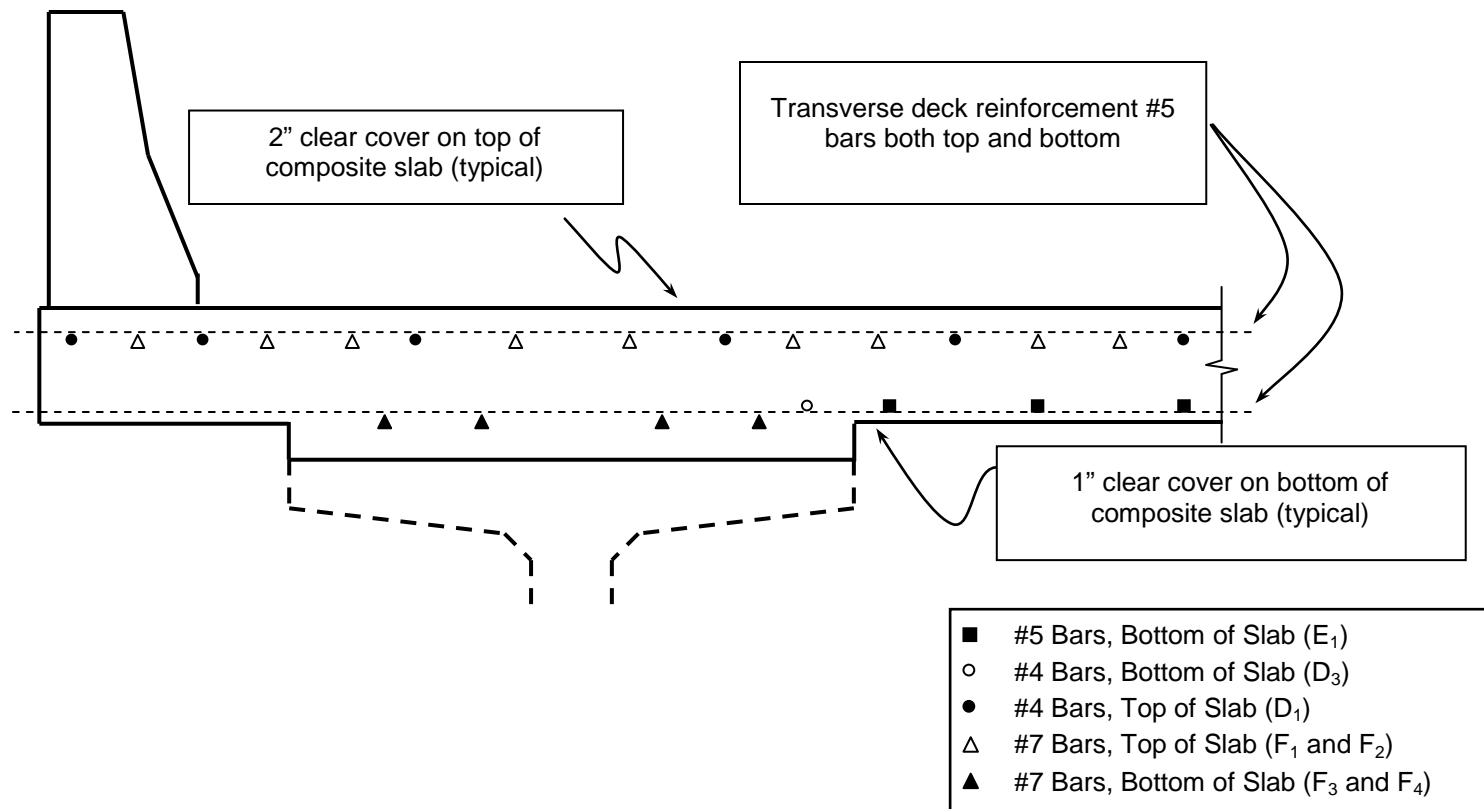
Cross section view of deck slab reinforcement over an exterior girder (ALDOT 1988; Swenson 2003)
